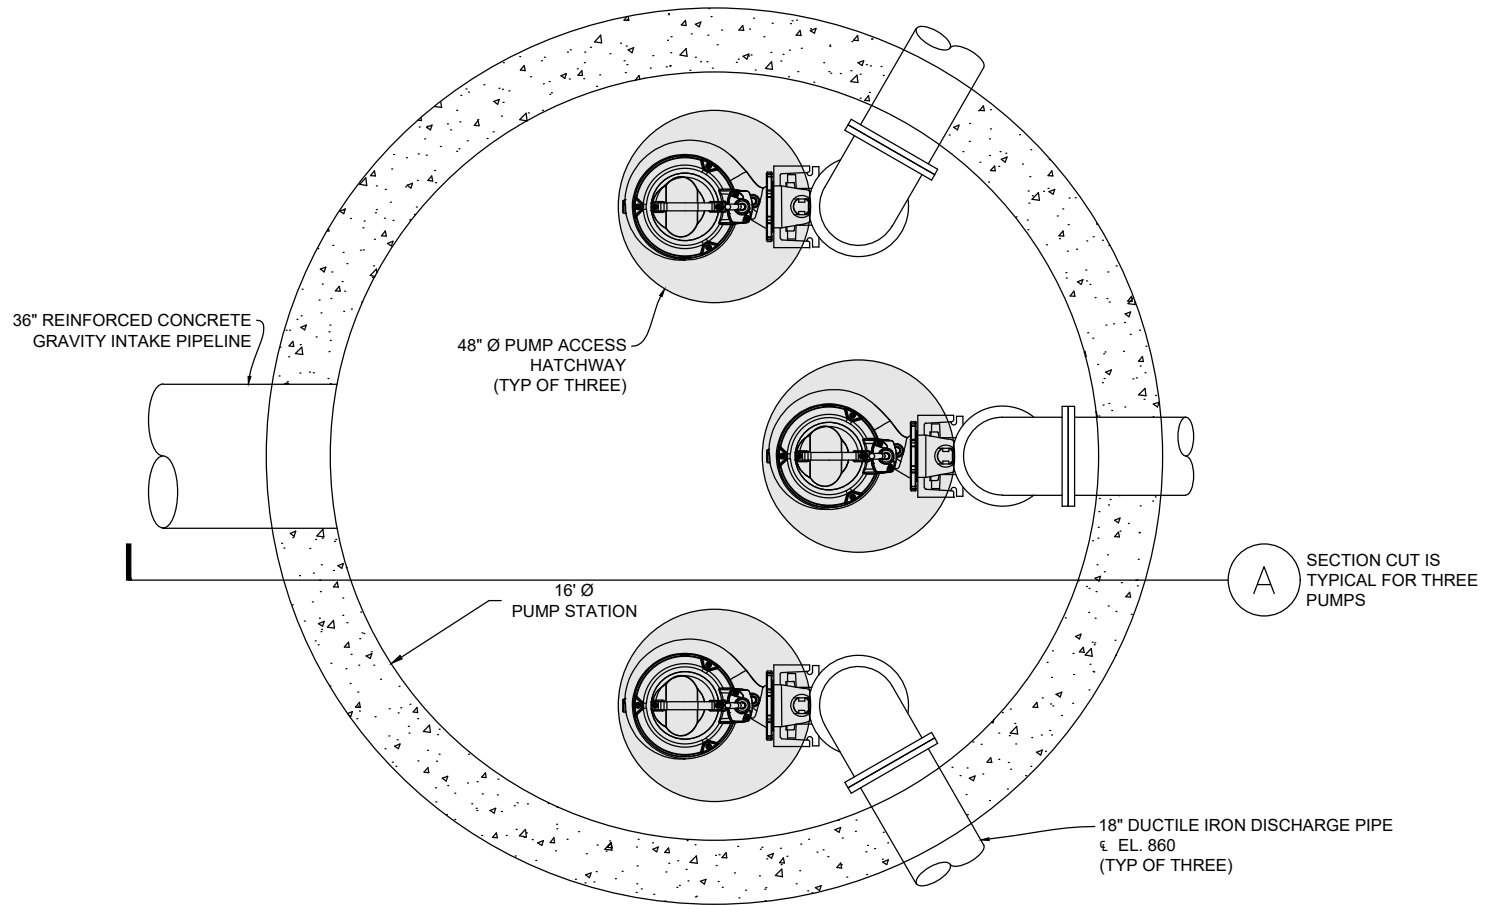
PLAN VIEW OF CYLINDER PUMP STATION
